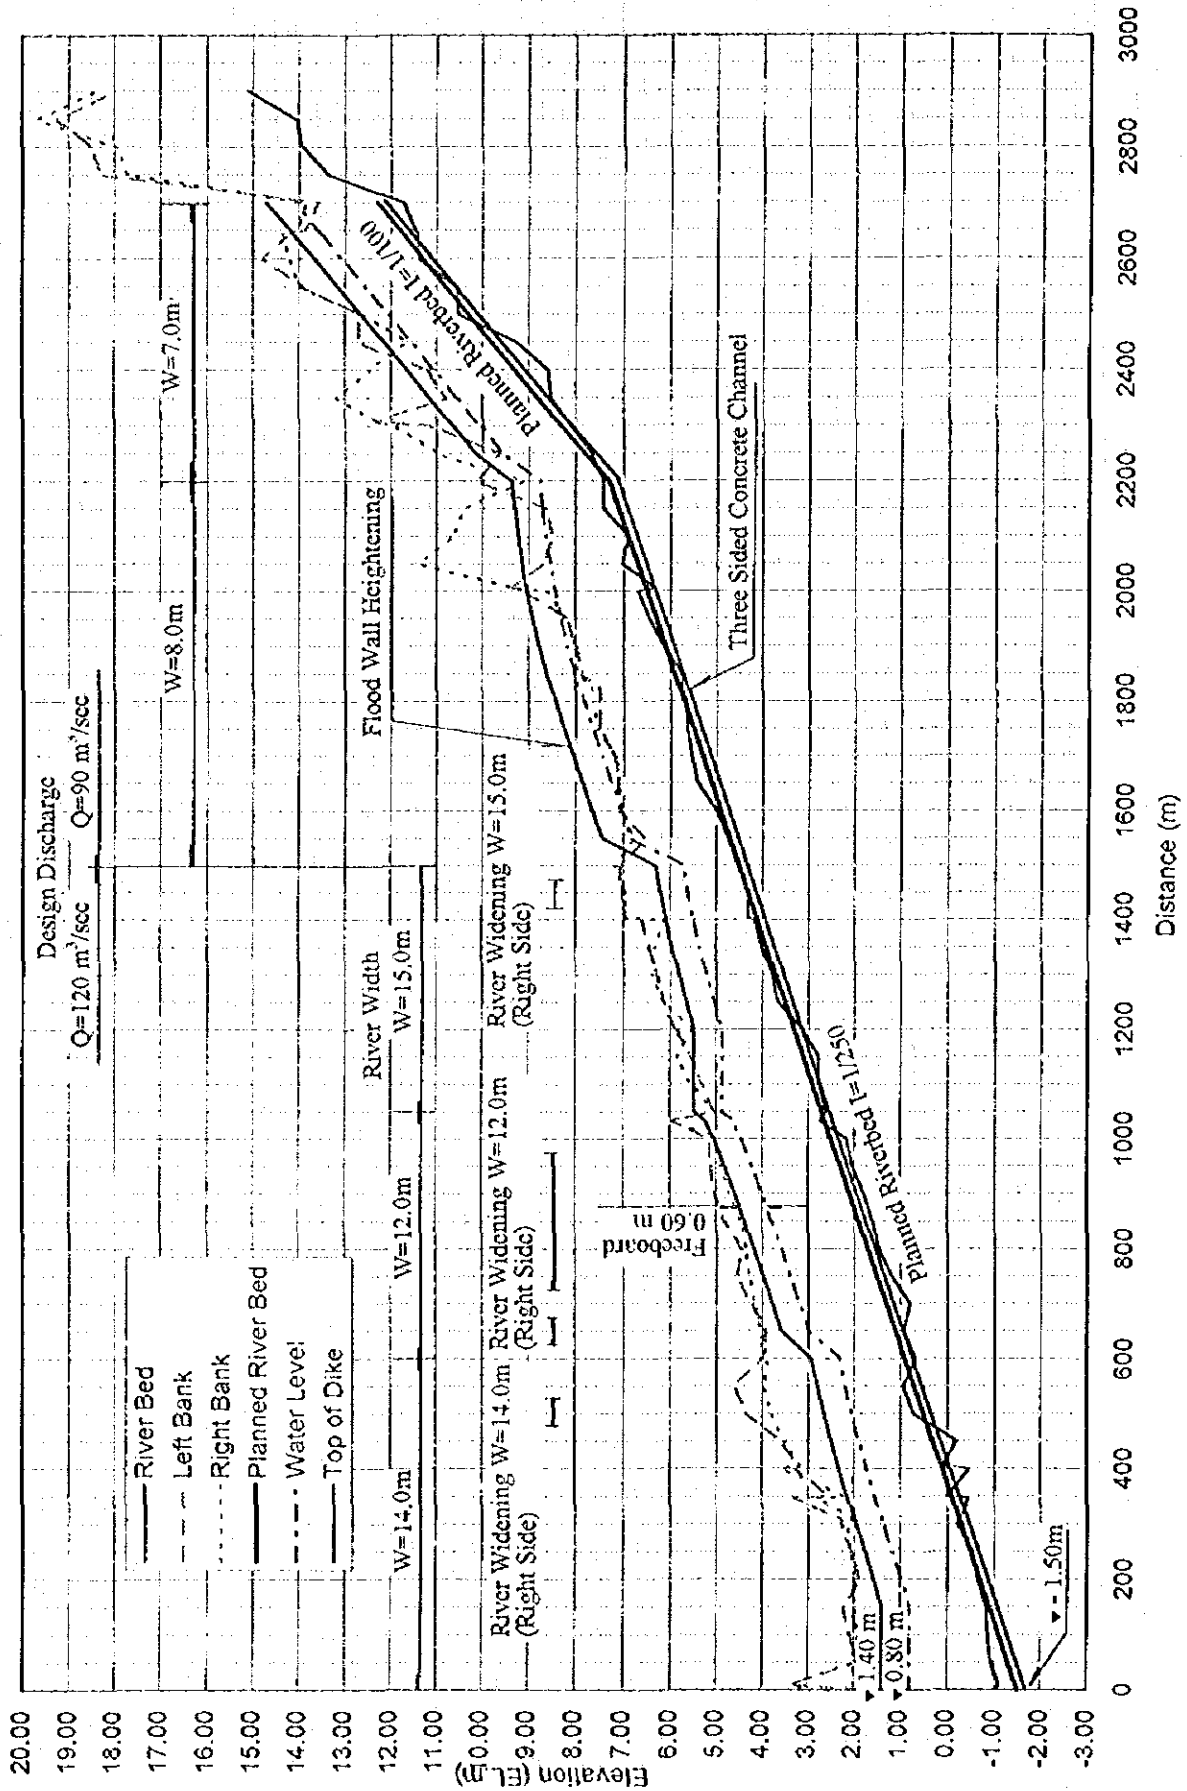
Longitudinal Section of Tomu River Improvement Plan
